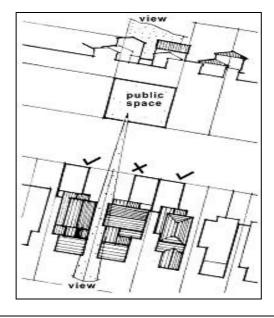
Building mass and roof orientation should sensitively enhance the public view corridor.
